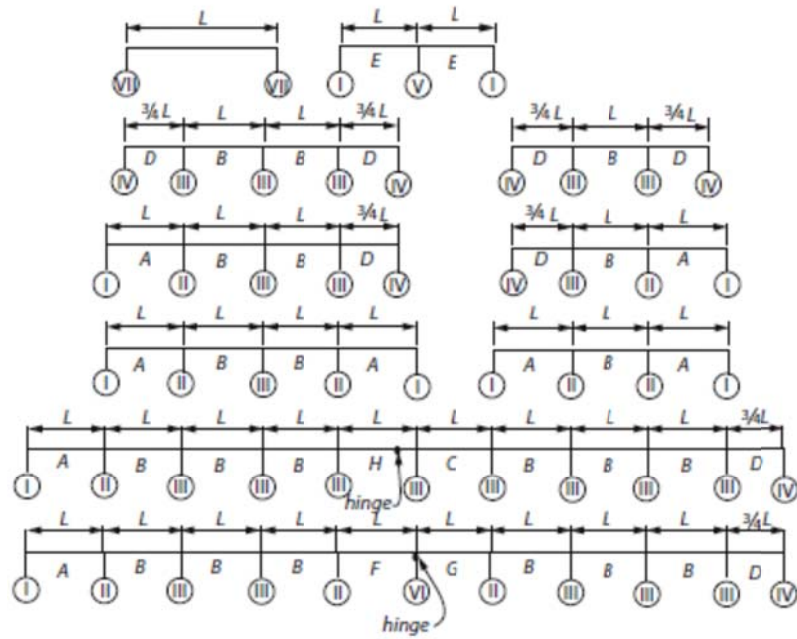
Typical bridge layout to determine support type (BDA 4-10, 2009)
